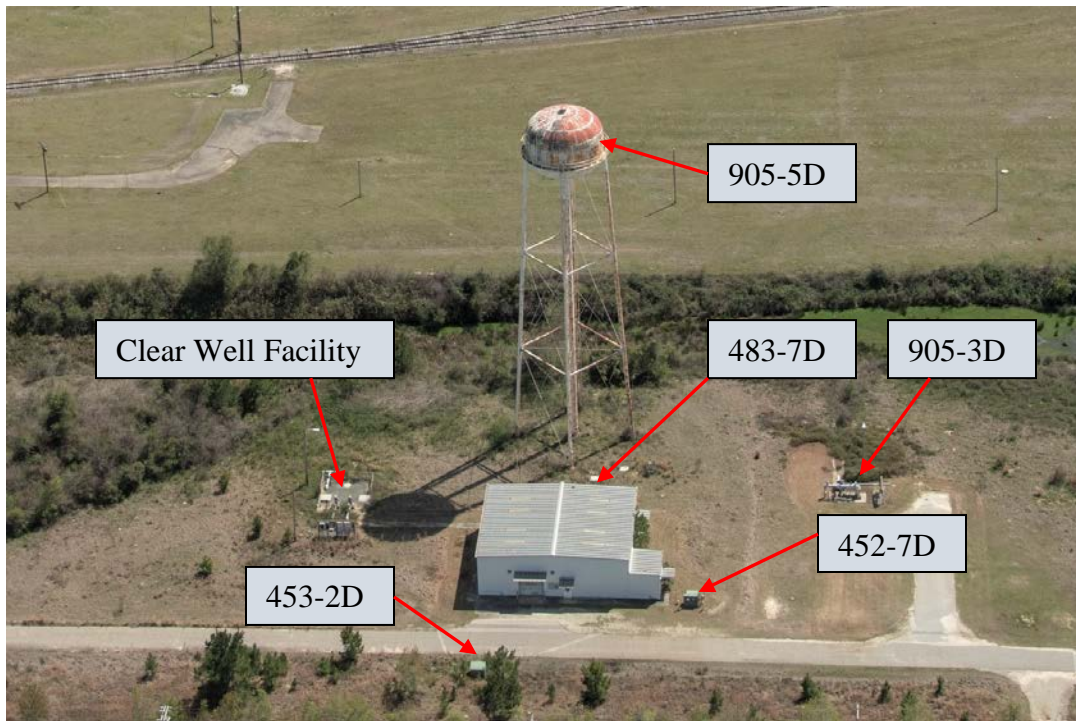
Building 905-5D Elevated Domestic Water Storage Tank
